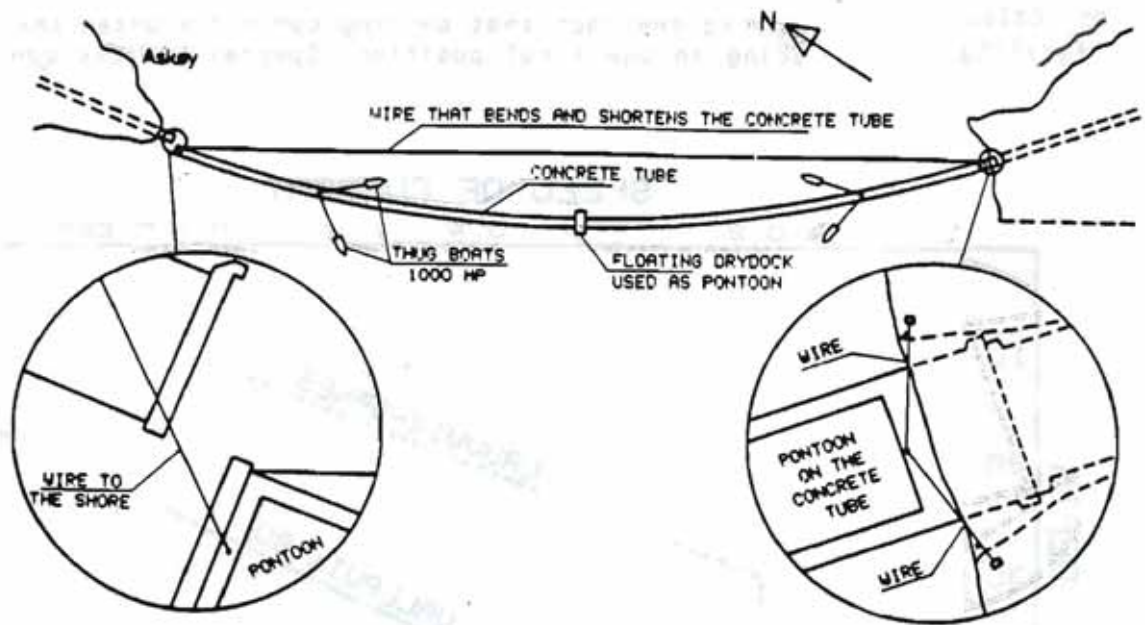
Stage in putting a horizontally curved immersed tube into a rock tunnel. At the north end a cable for pulling the tube into place is tight
